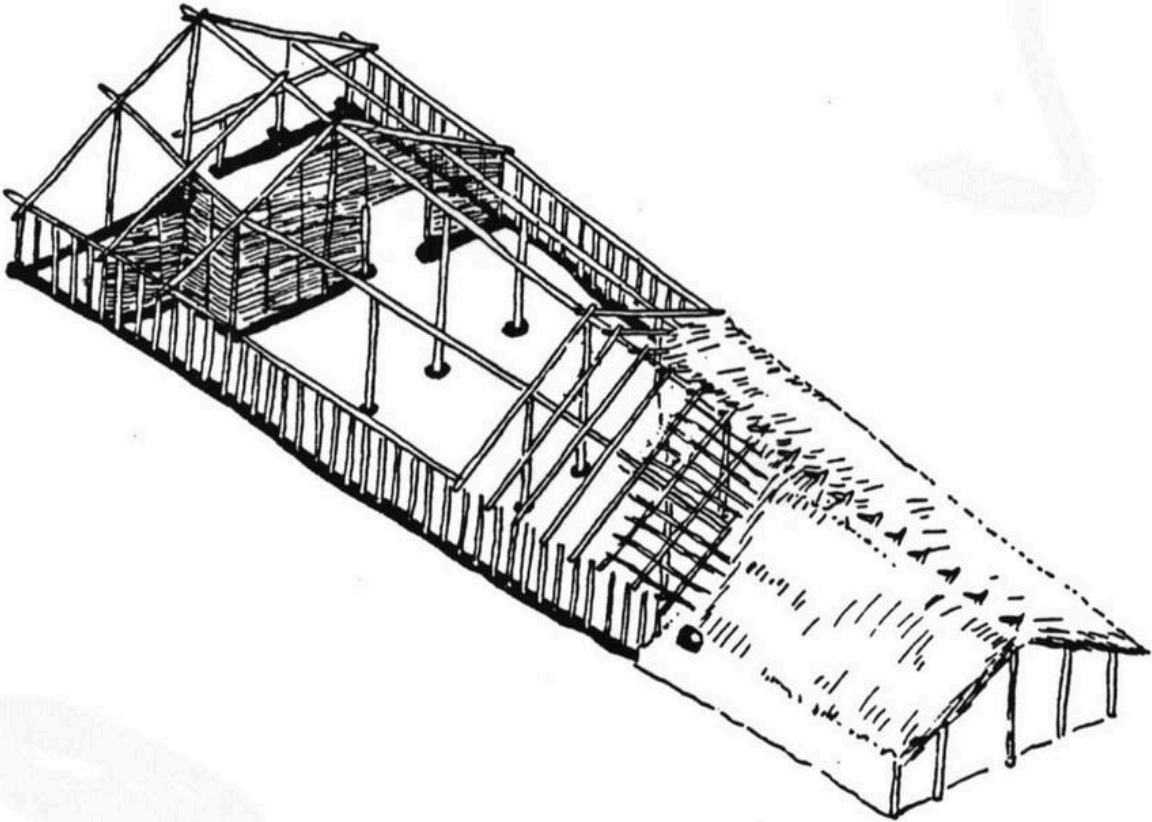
RECONSTRUCTION OF A TRAPEZIUM-SHAPED HOUSE (POSTOLOPRTY), AFTER SOUDSKY (1969).
